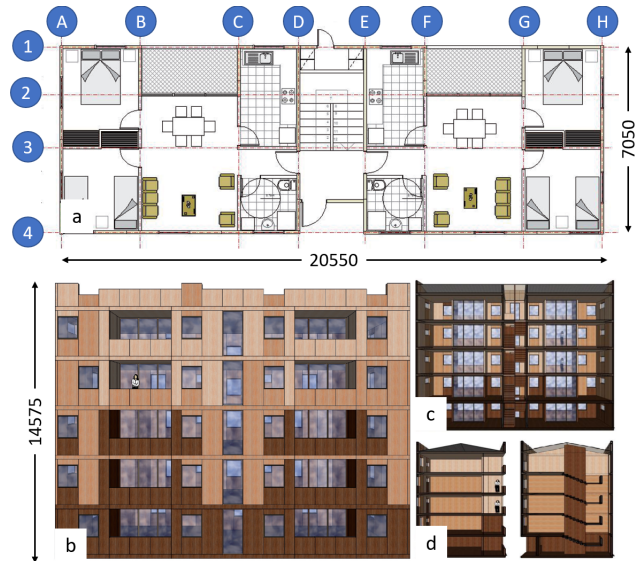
Building considered: (a) typical floor plan, (b) exterior longitudinal elevation, (c) inside longitudinal elevation, and, (d) transverse elevation. All dimensions in millimeters
